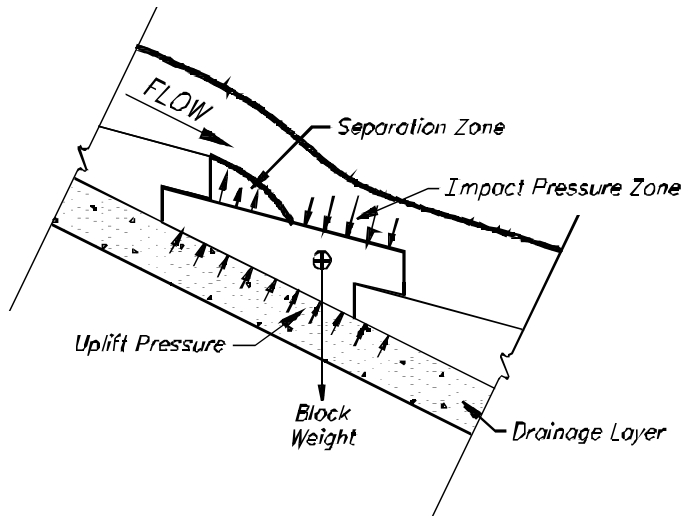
Block shape and force diagram for the tapered concrete block system. Vents are located in the overlapping portion of the block.
